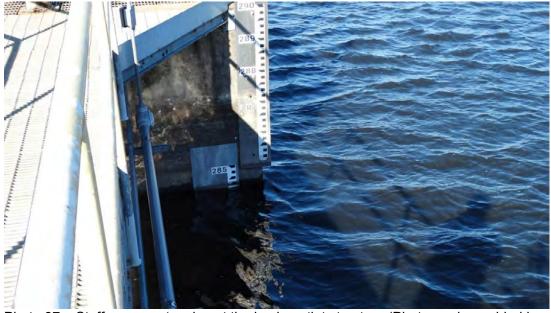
Staff gauge extension at the basin outlet structure (Photograph provided by Talen).
